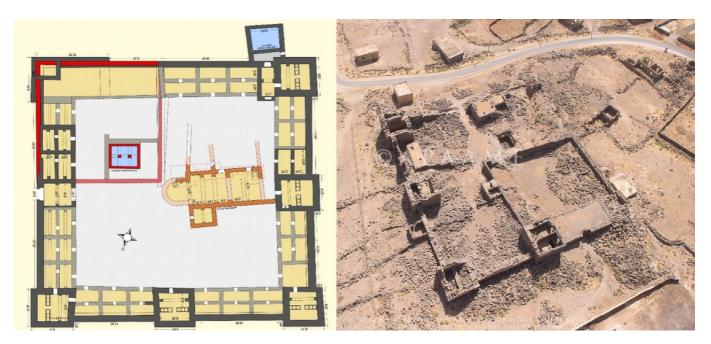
Site plan (Arce 2010) and aerial view of the site (APAAME).
